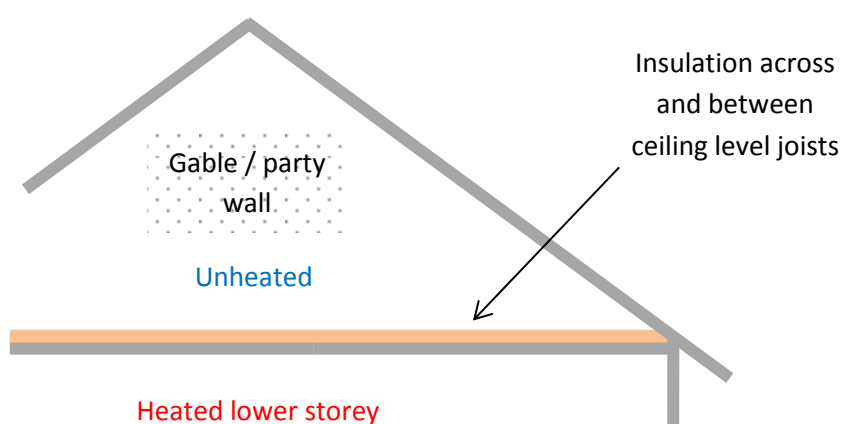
Cross-section showing basic elements of pitched roof construction with standard insulation
